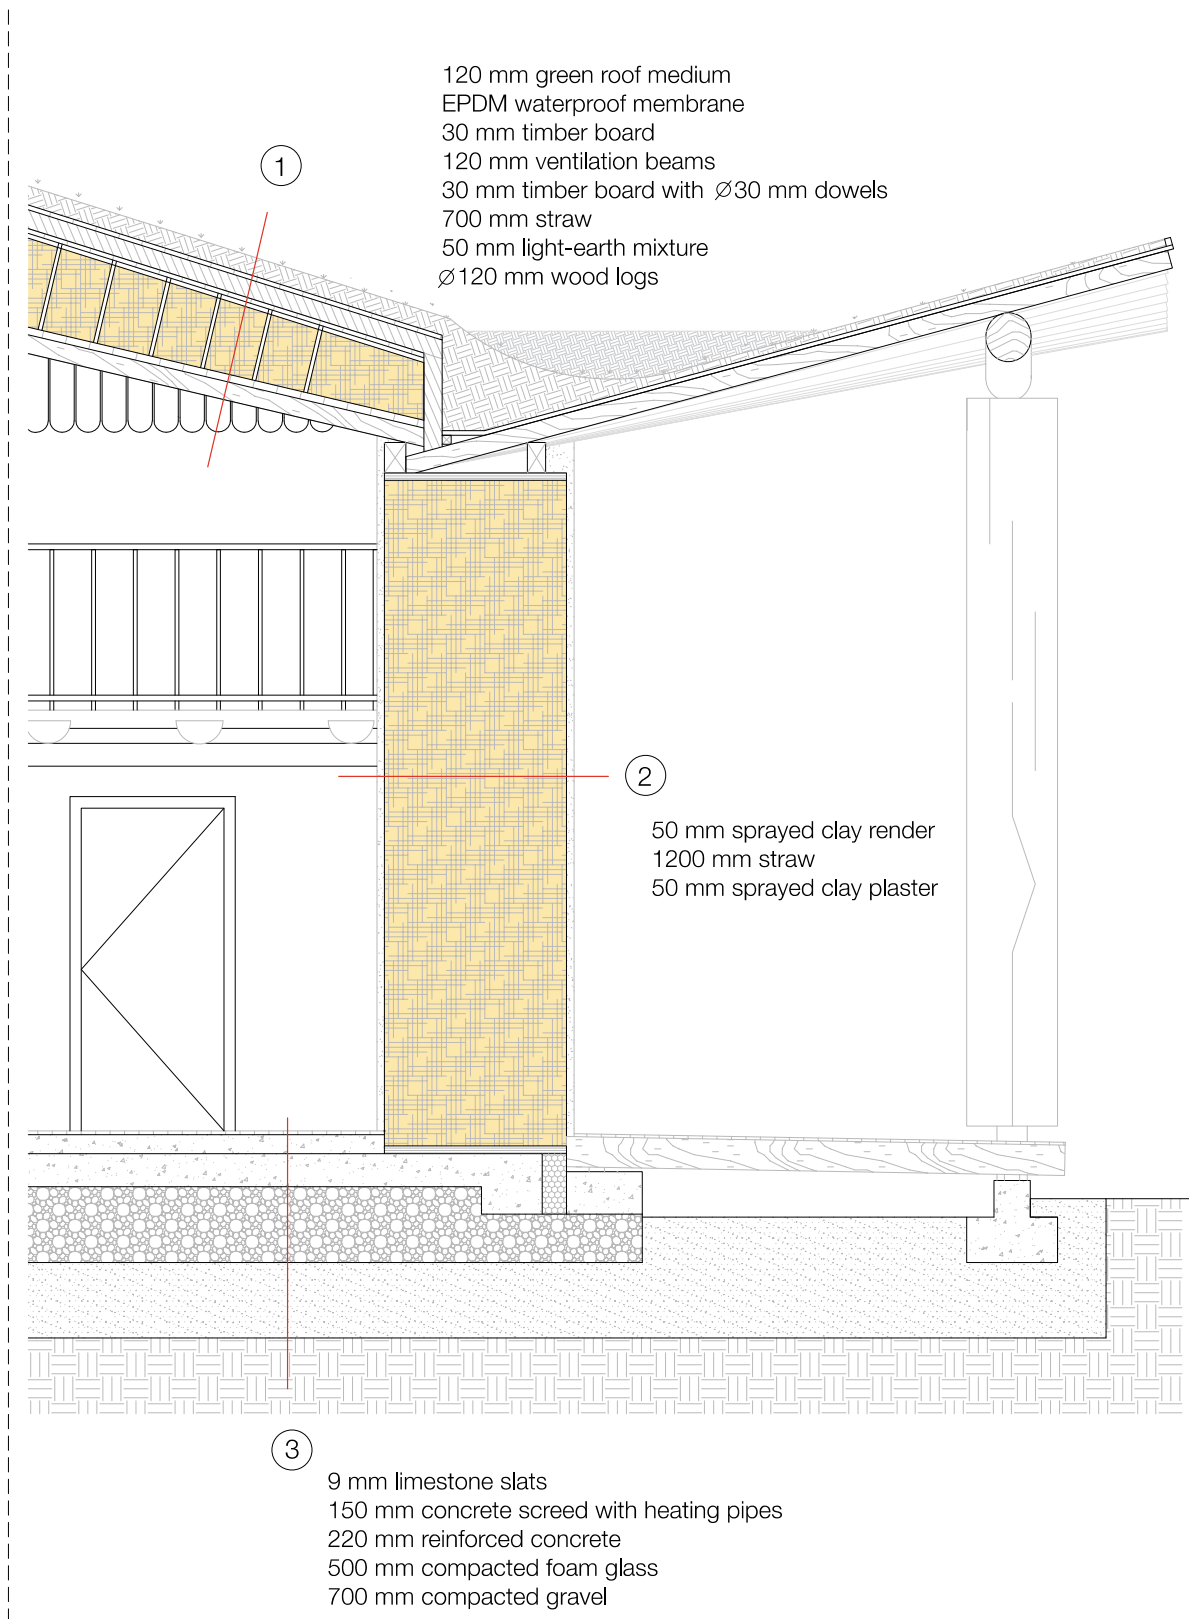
Section of Biotal external wall, entrance façade. Scale 1:50.
